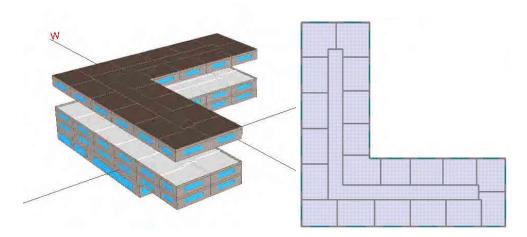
Mid Rise Building Energy Model 3D View and Floor Plan
